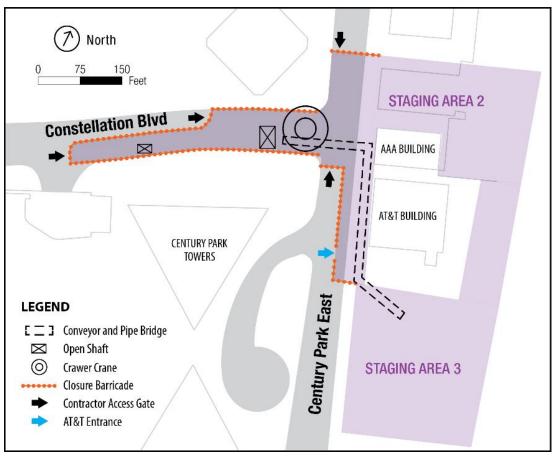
Alternative Construction Staging Area for the Project within Constellation Boulevard
